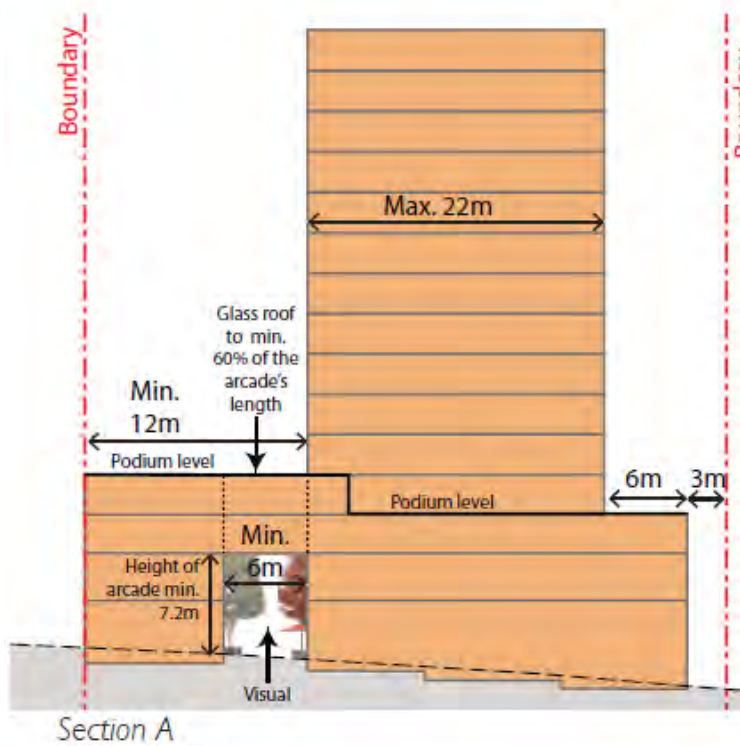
East-West Section of Site Building Envelope
